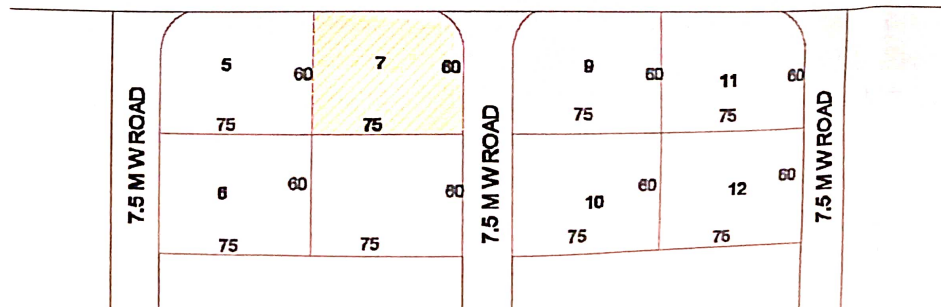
DETAILS OF LAYOUT/SUBDIVISION OF LAND
